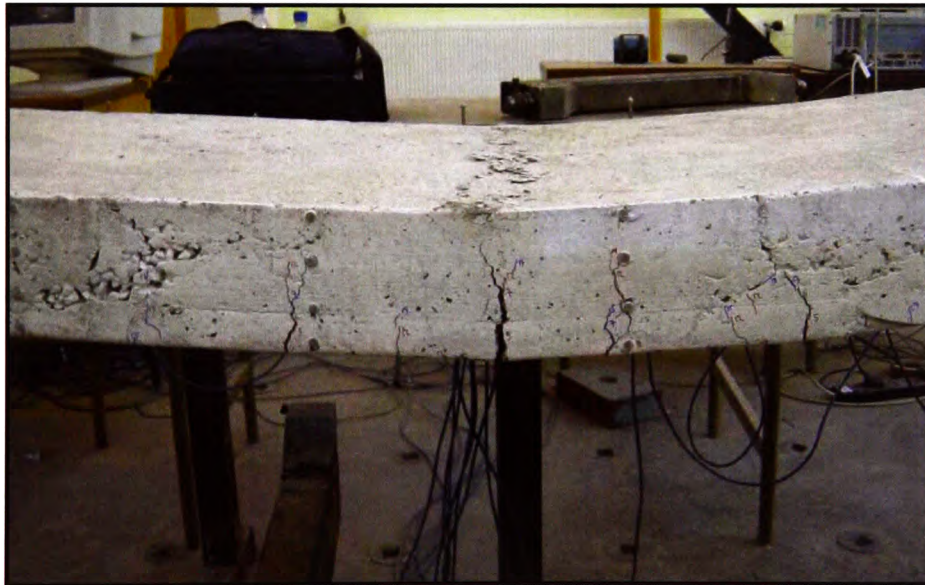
Photograph of normal failure of 8SCON, with steel yielding and concrete crushing
